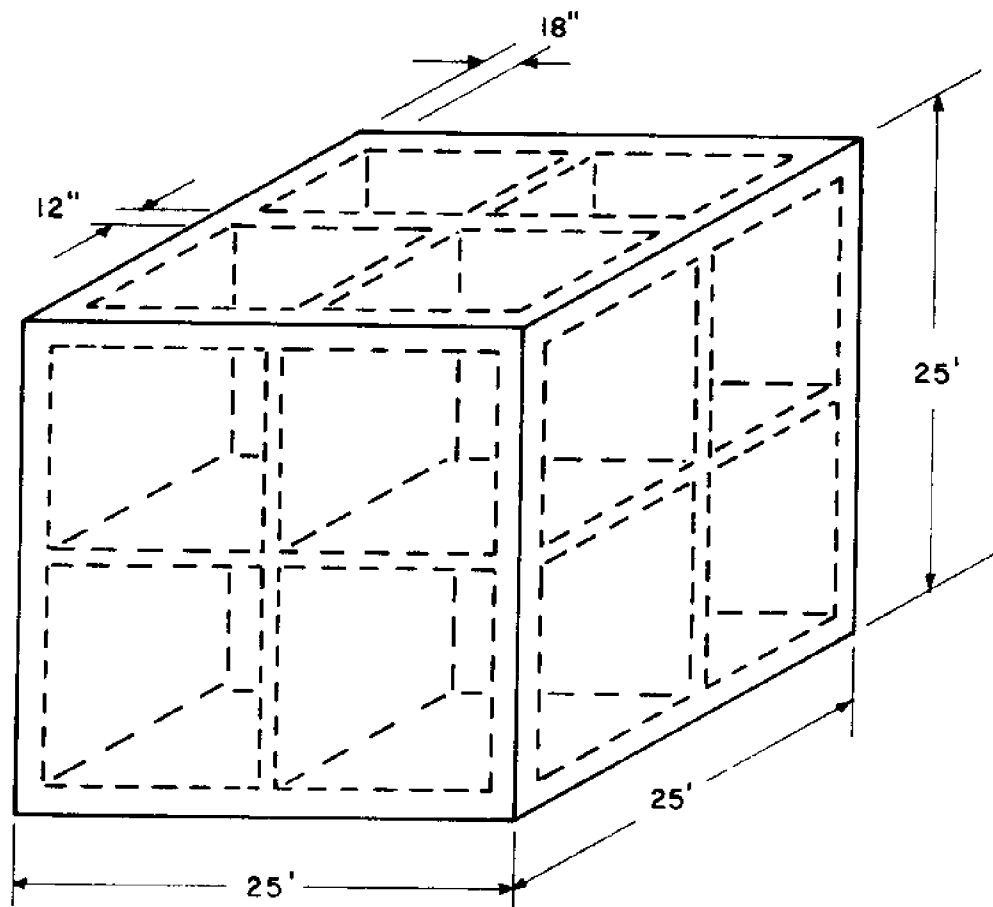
Typical pre-fabricated barge cube and assembled barge crosssection.
